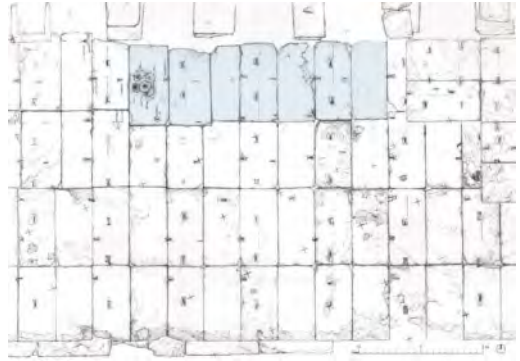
Excerpt of the documentation plan. Possible repair site highlighted.
